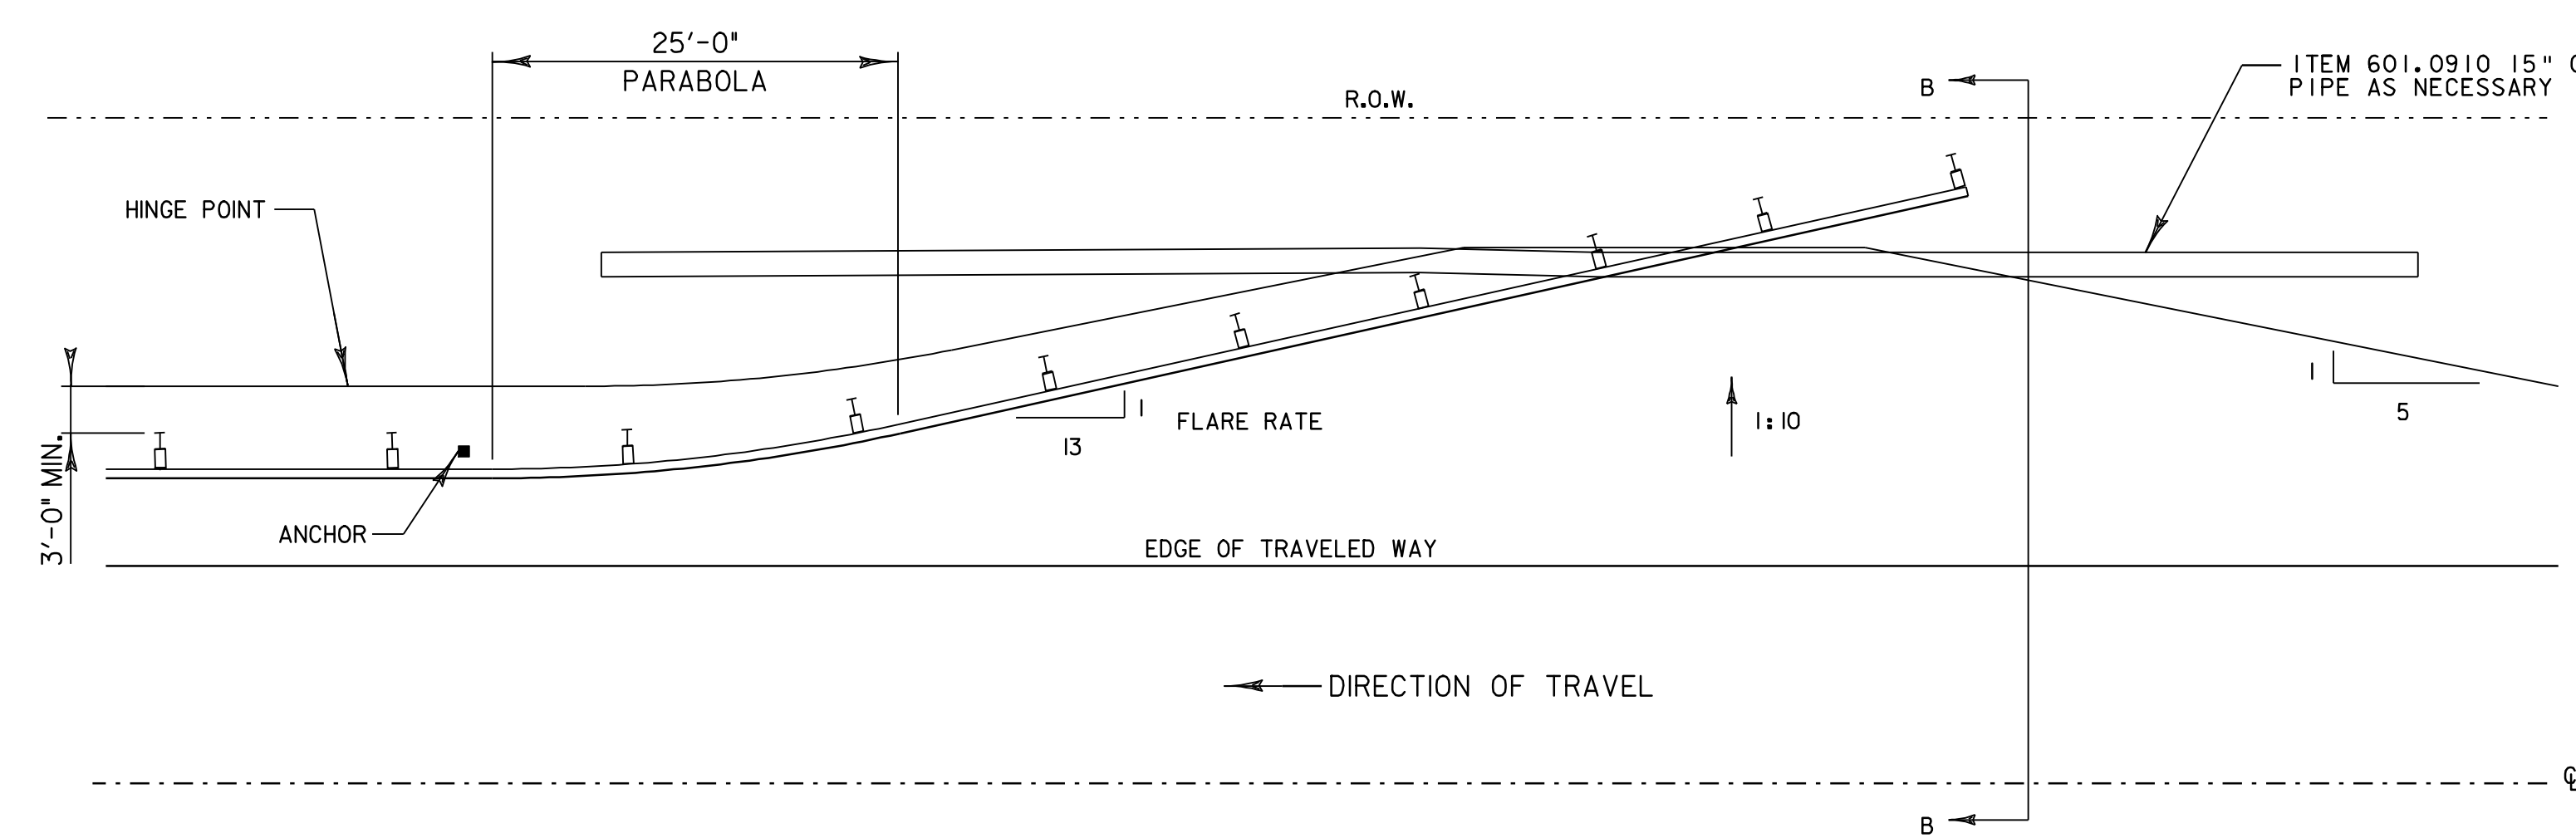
DETAIL OF STEEL BEAM GUARD RAIL AT LARGE CULVERTS
